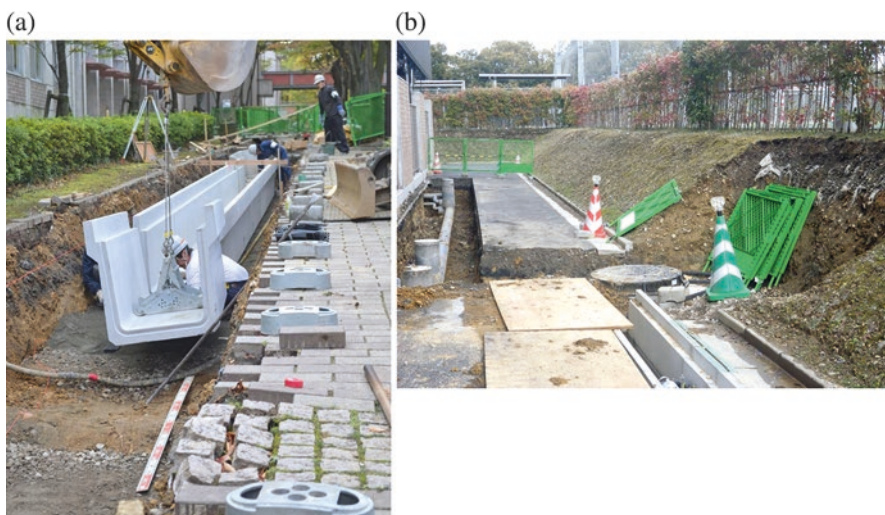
Photo (a) shows the installation of sewer pipe systems. Soil excavated to 1 m depth to install the U-type pipe was surveyed. Top of soil was sealed with interlocking pavement. Photo (b) shows the installation work of a sewer pipe system sealed by asphalt pavement
